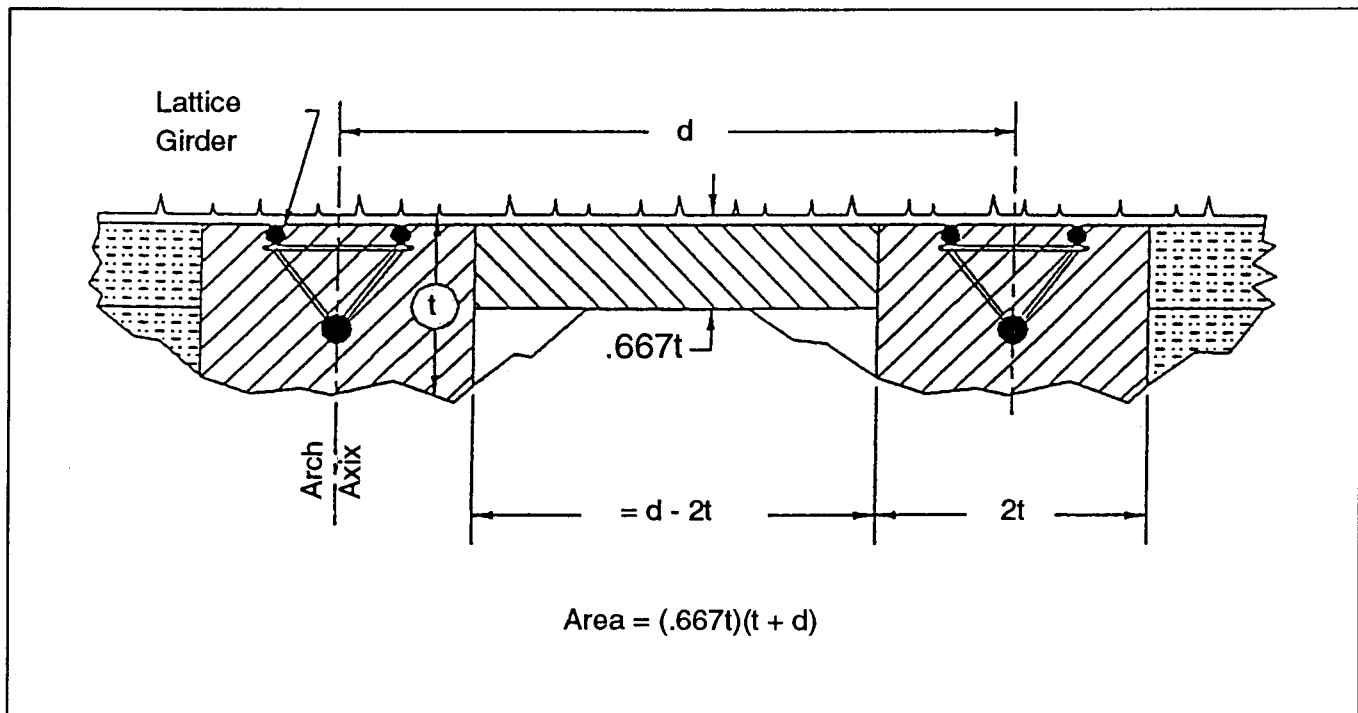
Estimation of cross section for shotcrete-encased lattice girders
